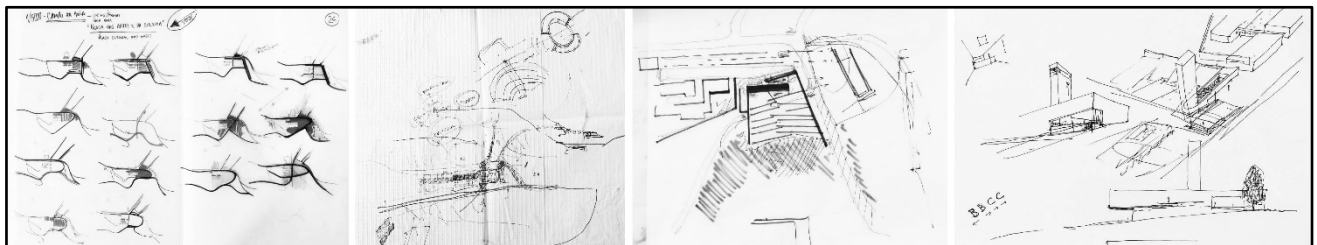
Praça da Cultura e das Artes – Source: photo of the authors
